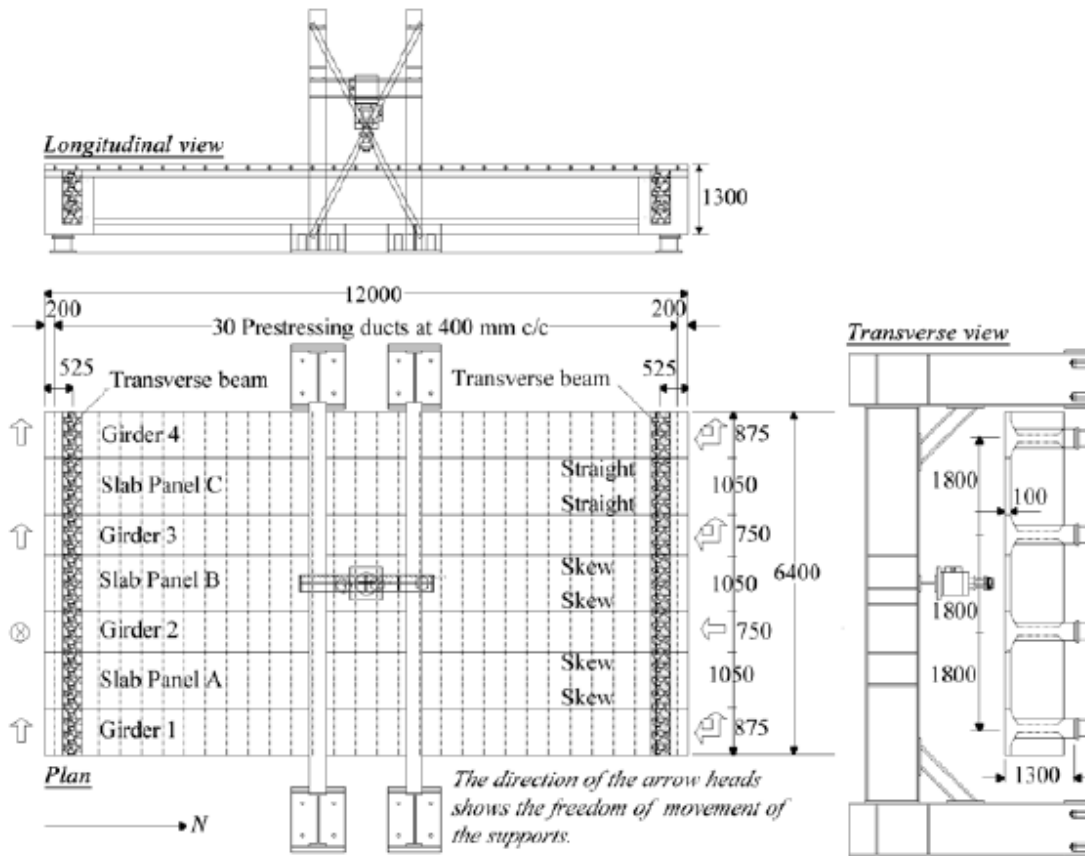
overview of test setup and geometrical data of girders and slab (Stevin Report No. 25.5.13-06, 2013)
